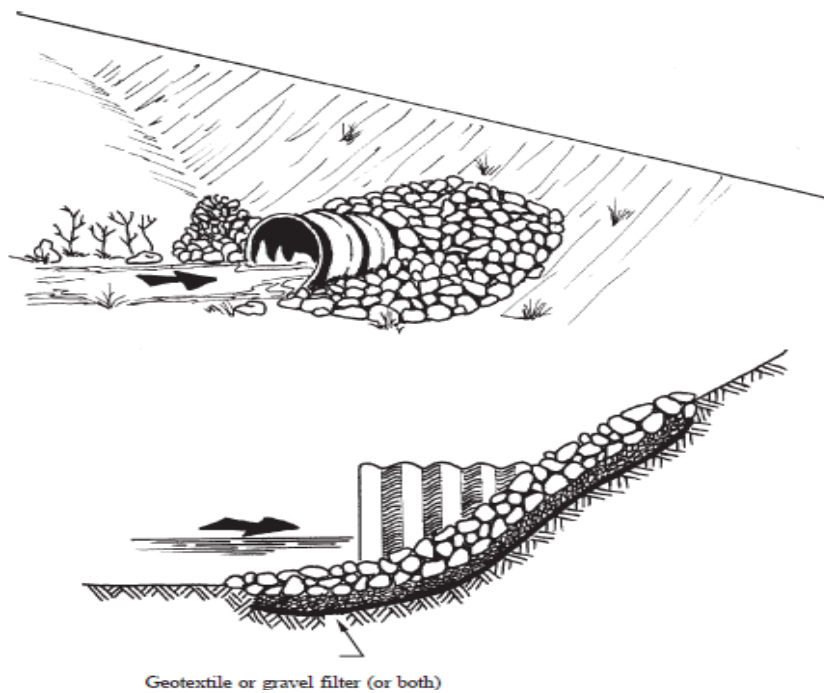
Normal metal culvert installation using riprap around inlet and outlets of culverts [6]
